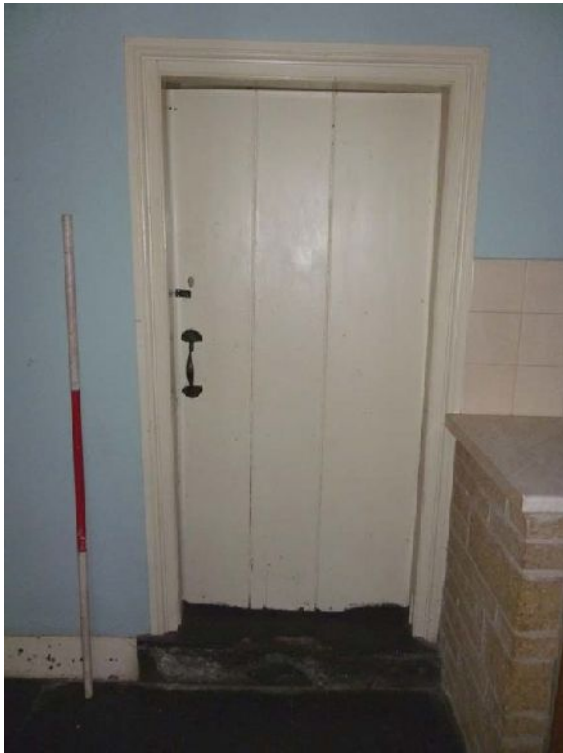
(left): Doorway on north-west side of north-east elevation, Room G6
